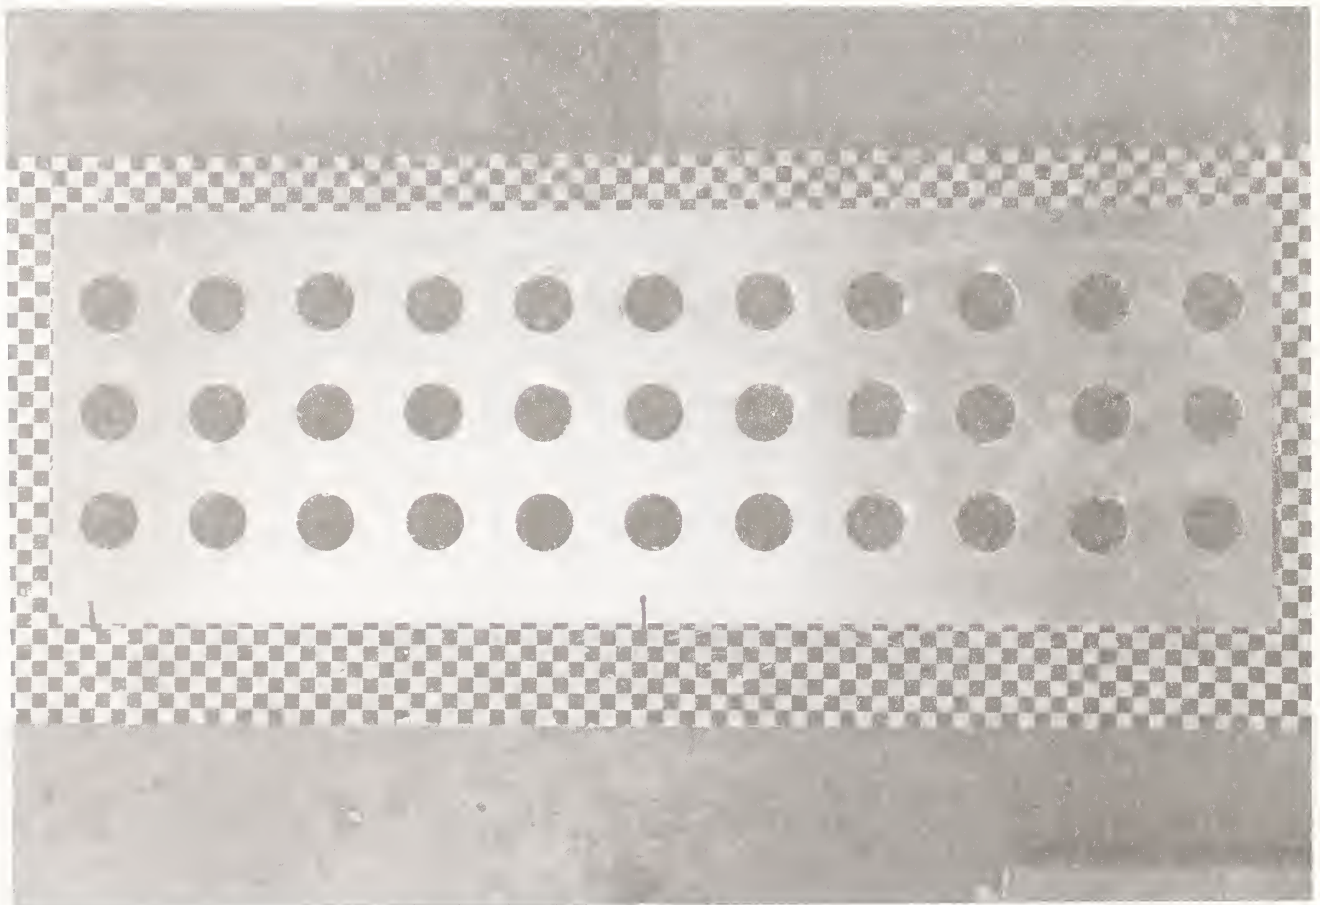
PRE-TEST MDB FACE - VIEW 1
